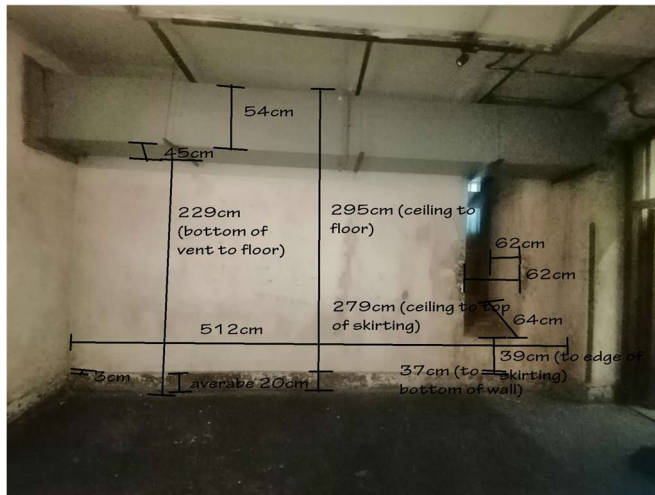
In-situ digital photographs with notes of the North wall measurements. Photograph by author.
